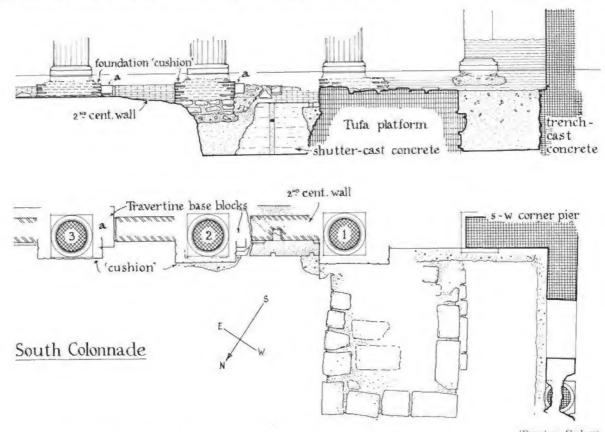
S. Pietro in Vincoli, South colonnade, plan and elevation of footings
